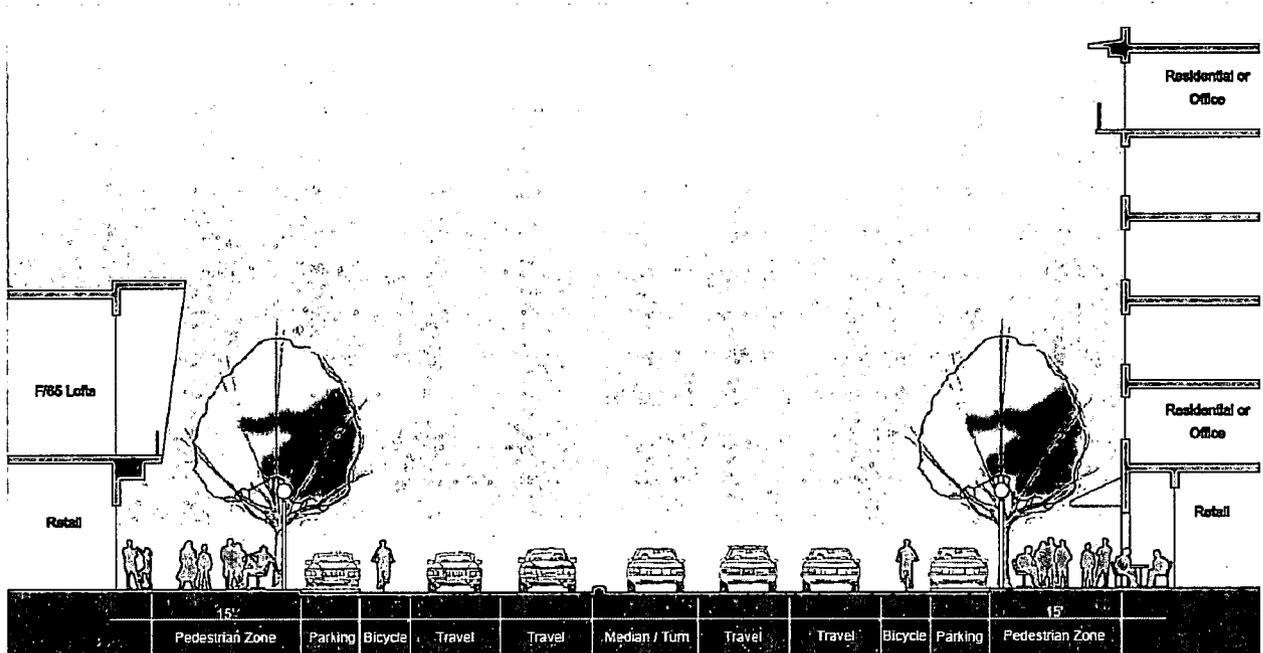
65<sup>th</sup> Street between Folsom Boulevard and Q Street
